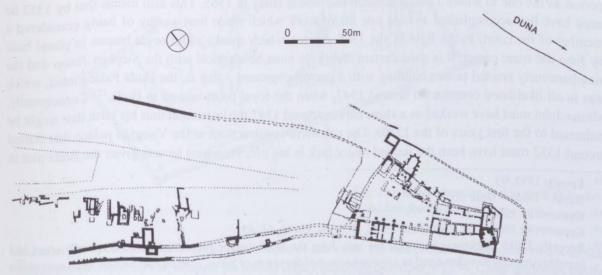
Reconstructed ground plan of the castle of Buda in the late fourteenth century
